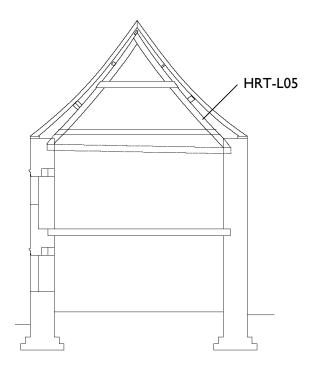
Truss 3 (west face), showing the location of sample HRT-L05 (Morton & Hall Consulting Ltd)
